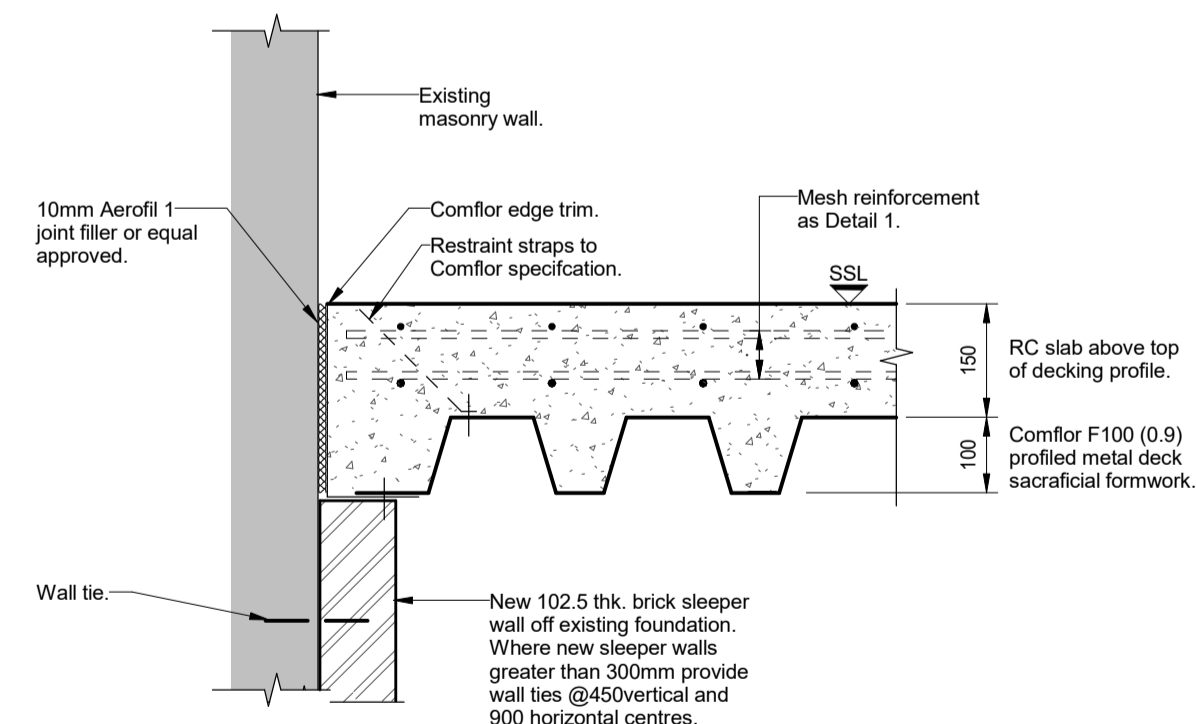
Proposed Slab Bearing on Sleeper Wall
